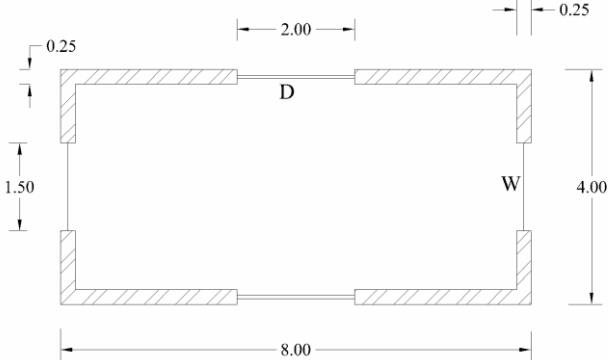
Ground floor and first floor plan of the structure (dimensions in m)
